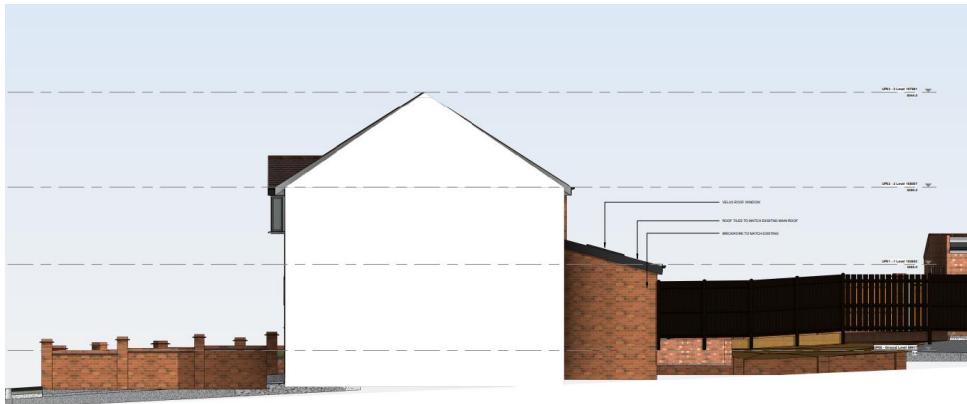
Side (NE) elevation showing rear extension (approved Jun 2021)
